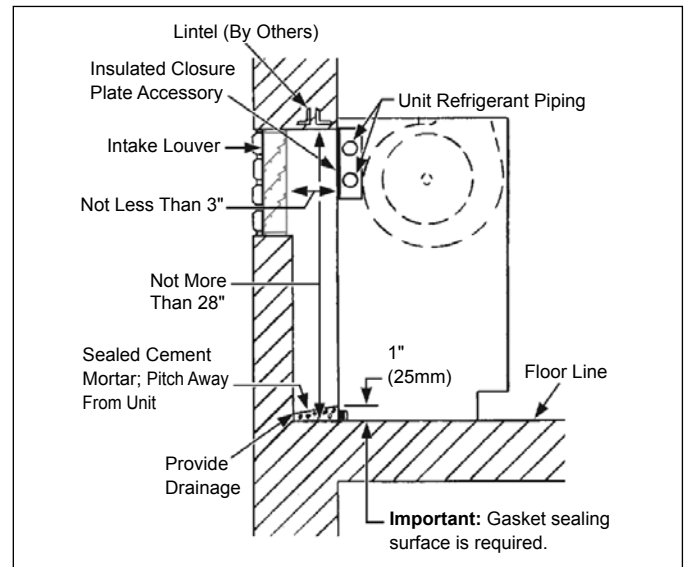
16<sup>5</sup>/<sub>8</sub>" (422mm) deep unit with open refrigerant pipe chase & above-floor-level outdoor intake louver application with chased wall
